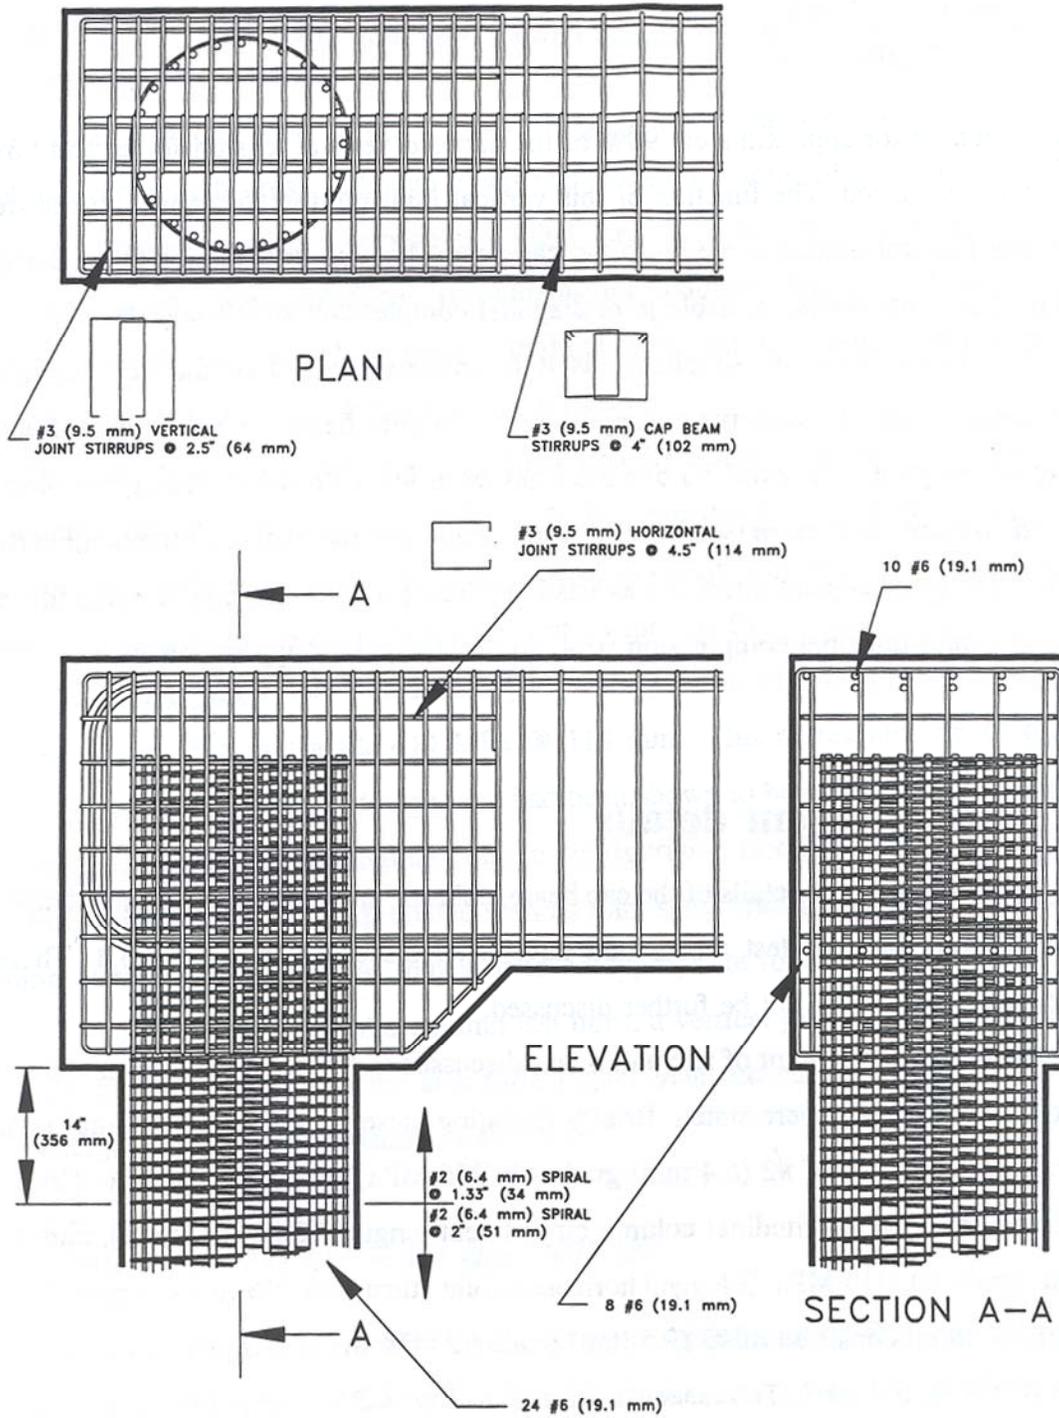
Plan and Elevation of Knee-Ing-RND-4
